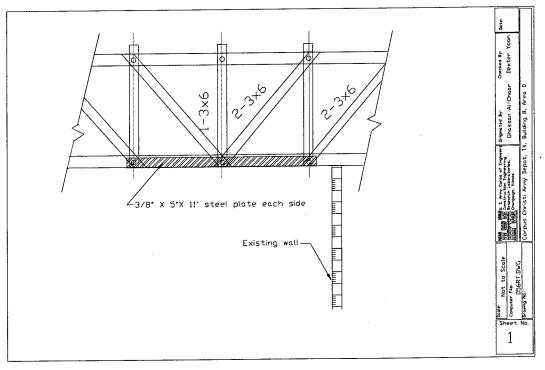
Proposed repair for Member TR in Truss Column Line 56, Area D.
